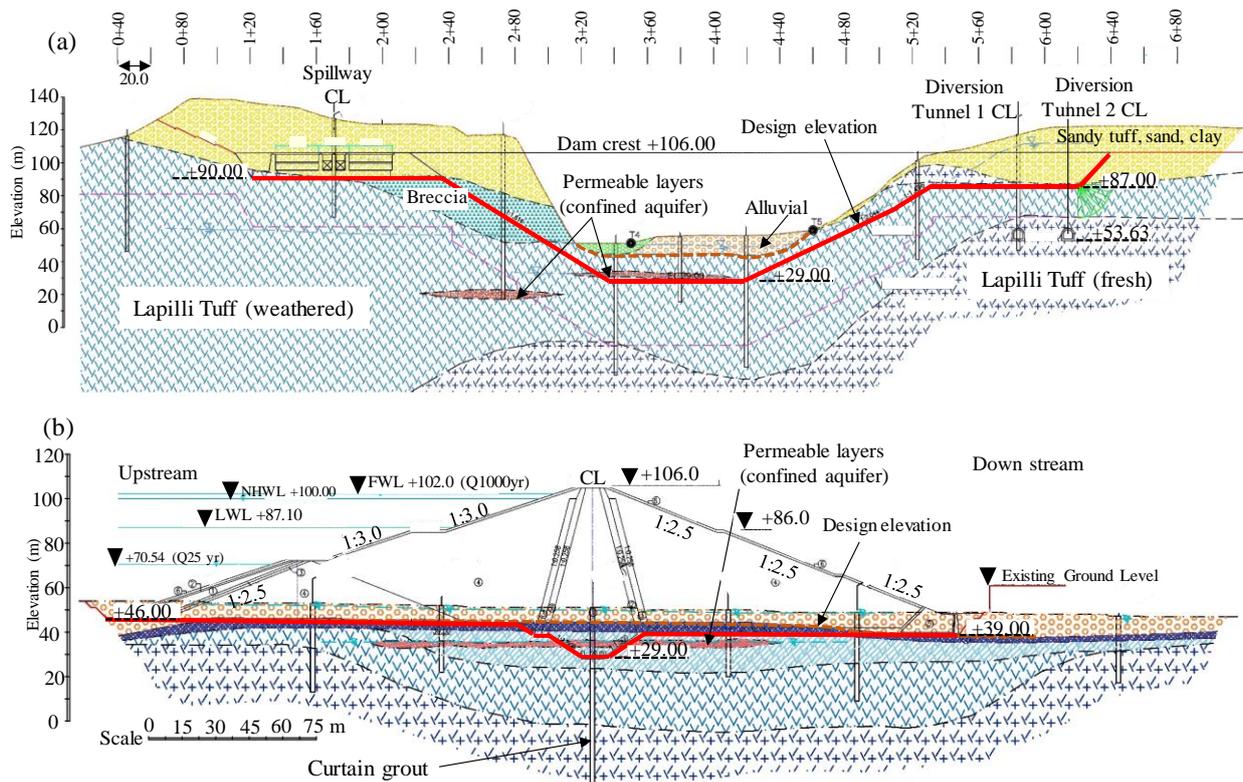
Dam design prior to additional site characterization: (a) long section and (b) cross section
